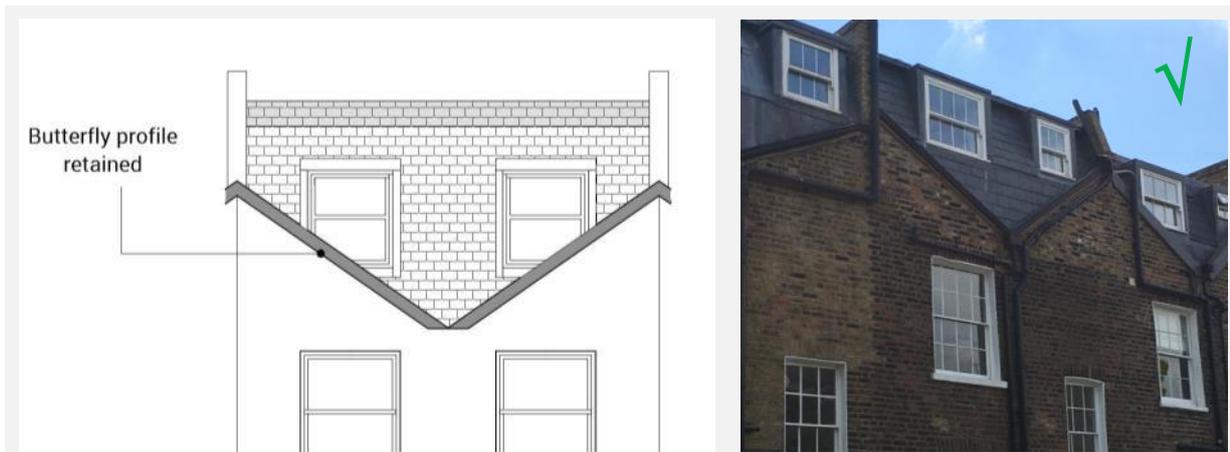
Where butterfly parapet profiles are a characteristic feature, these should be retained.
